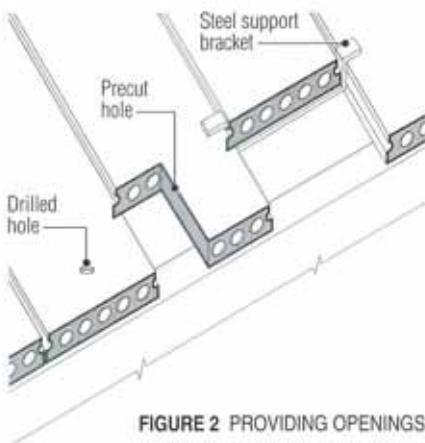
PROVIDING OPENINGS AND PENETRATIONS
